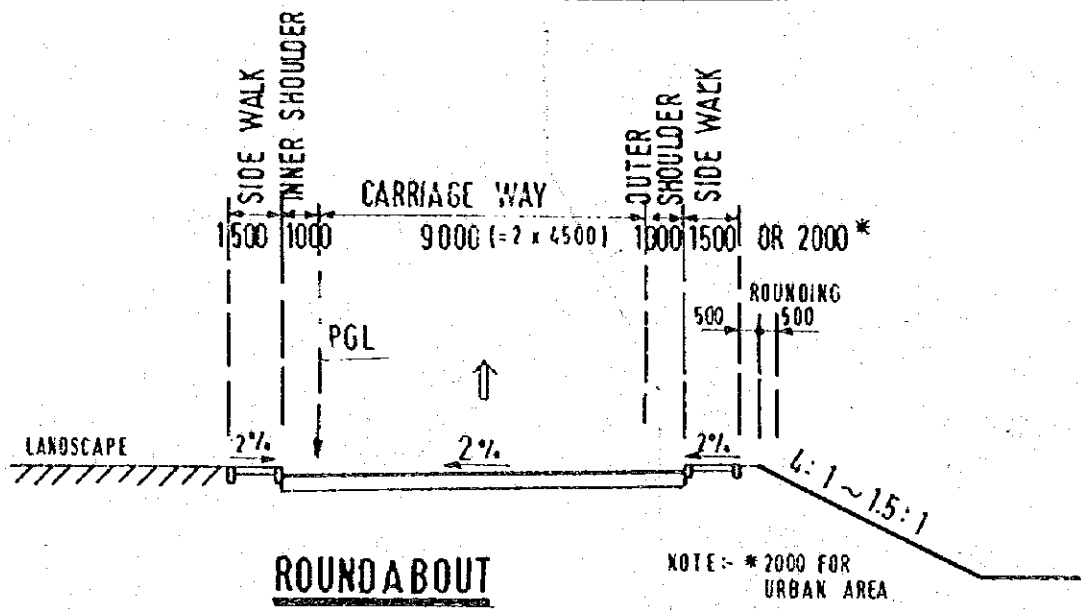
Typical Cross-Sectional Details of Proposed Cross Roads and Roundabout
